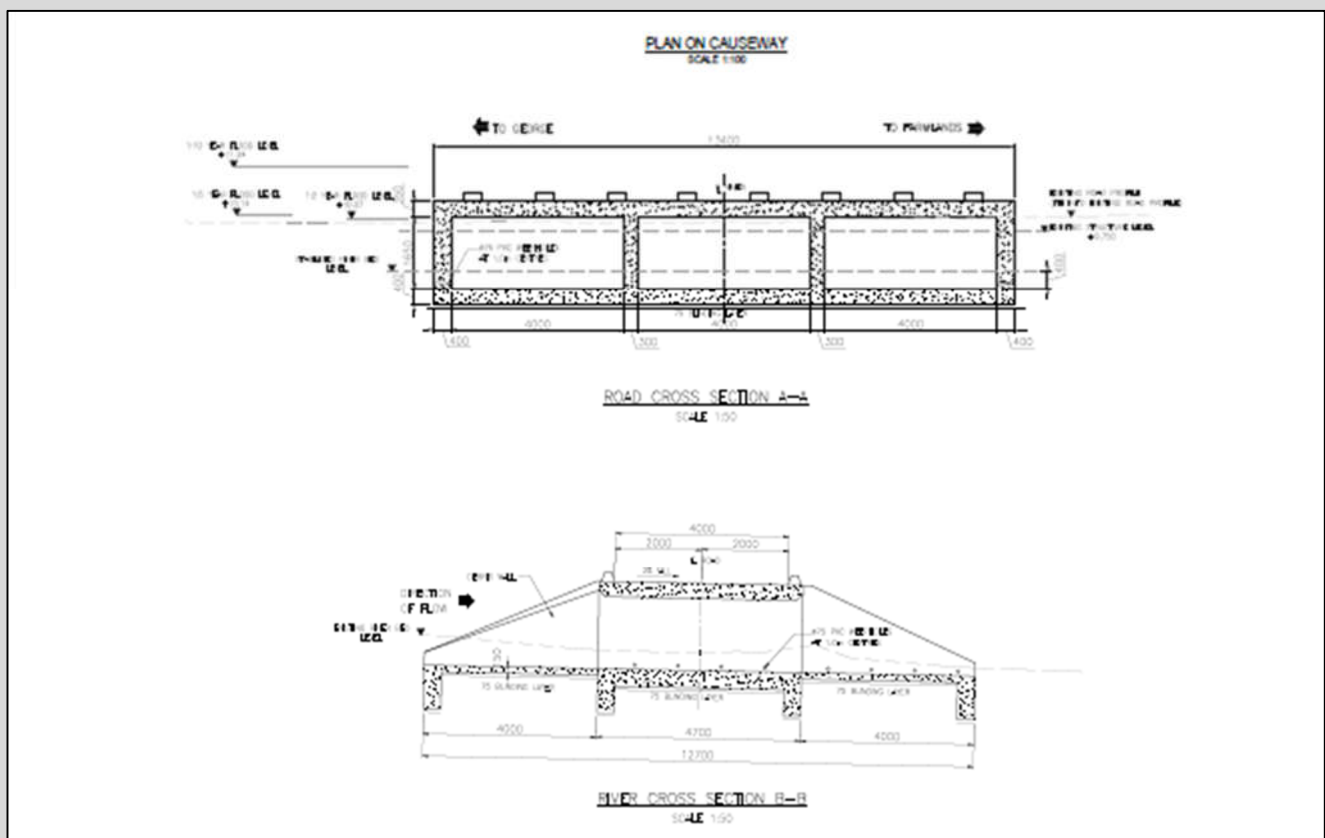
Cross-section of the proposed causeway construction along DR1791, (Hatch Engineering, 2025).
